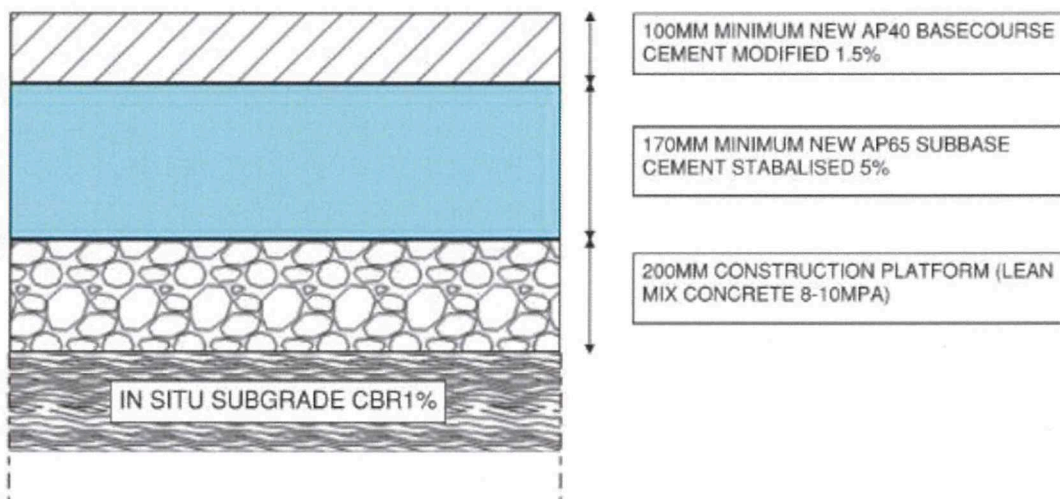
Ruataniwha Road typical pavement section used within the floodway
